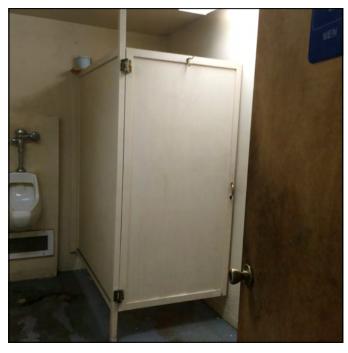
Bridge Building restroom with old tile floor. Women's has similar floor.
